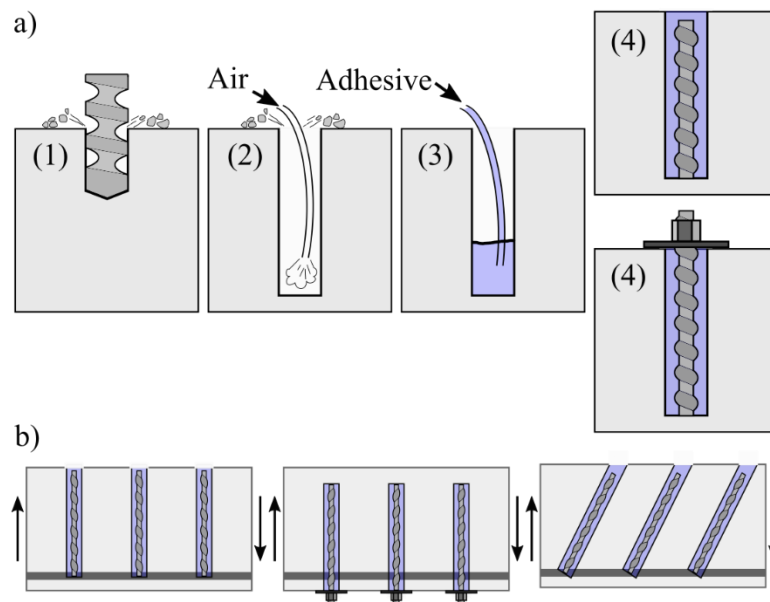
a) The installation steps of reinforcing bars embedded through section: (1) drilling of hole, (2) cleaning the hole, (3) injection of high-strength epoxy adhesive and (4) insertion of the reinforcing bar; b) examples of vertical and inclined bonded shear reinforcement configurations, with and without an anchor plate
